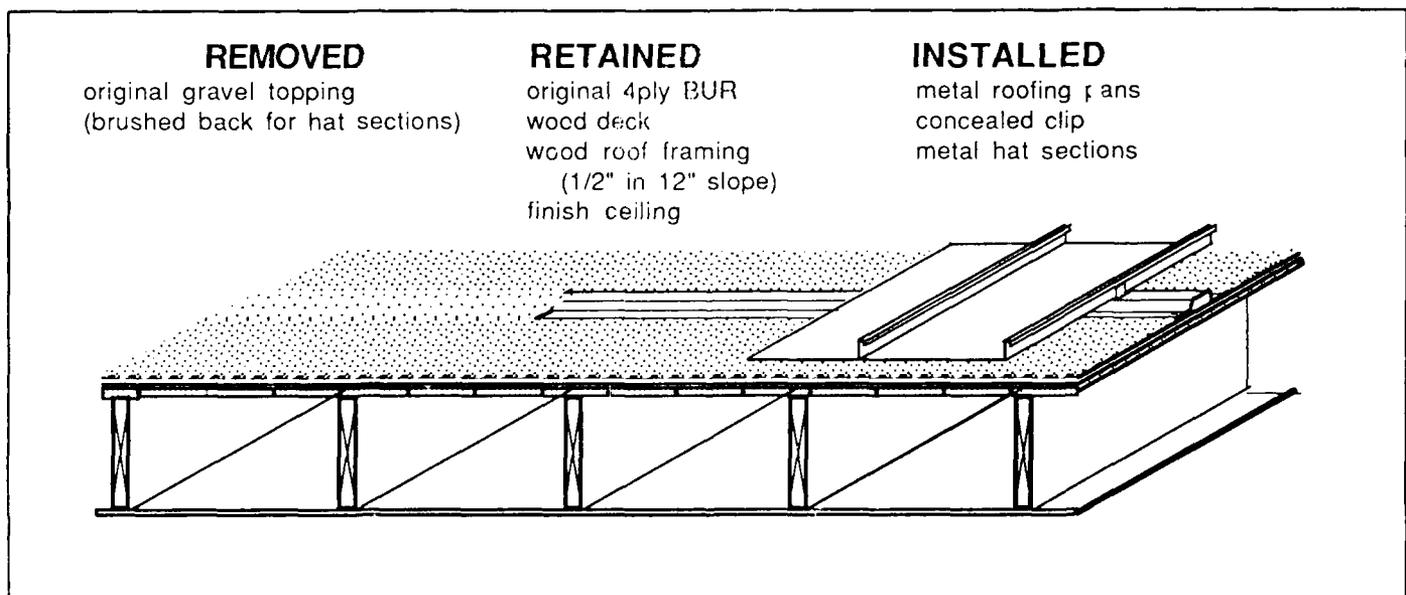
Schematic of standing seam metal roof installed over wood deck.
